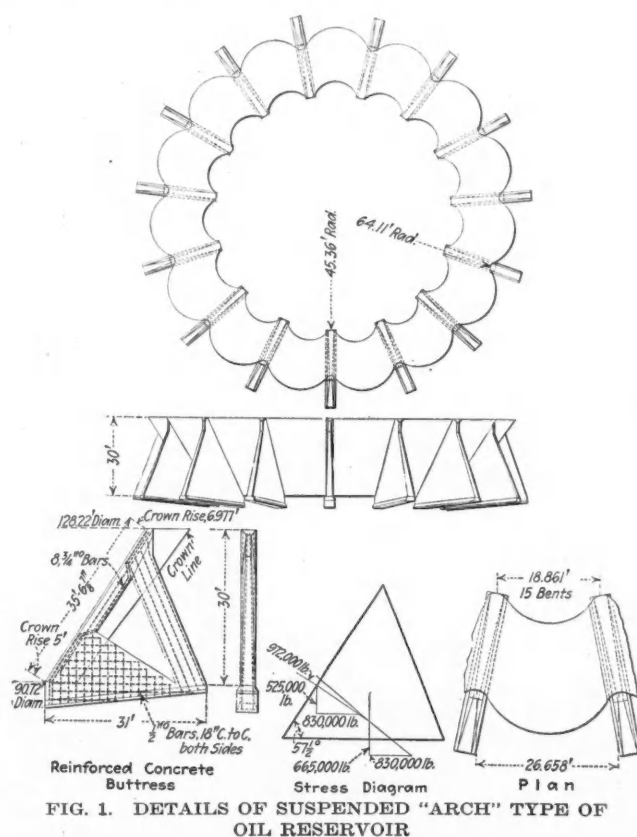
DETAILS OF SUSPENDED "ARCH" TYPE OF OIL RESERVOIR
